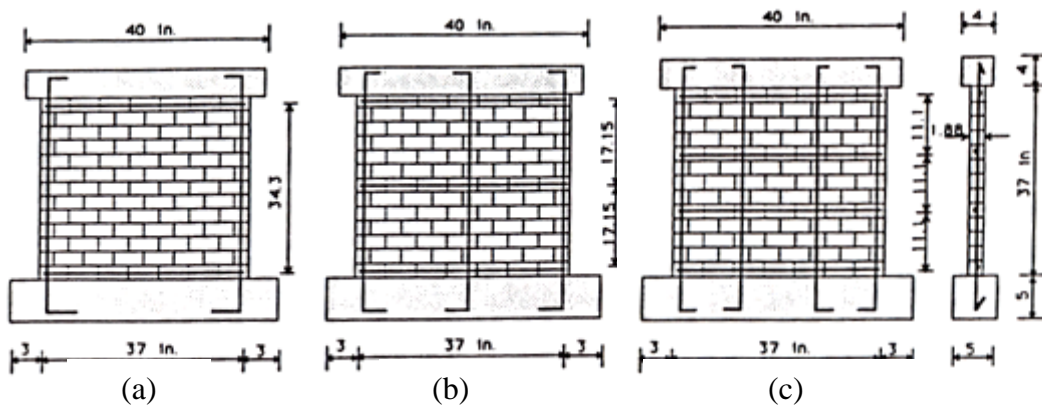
Reinforcement configuration for (a) Wall SWA, (b) Wall SWB, and (c) Wall SWC (taken from [7])
